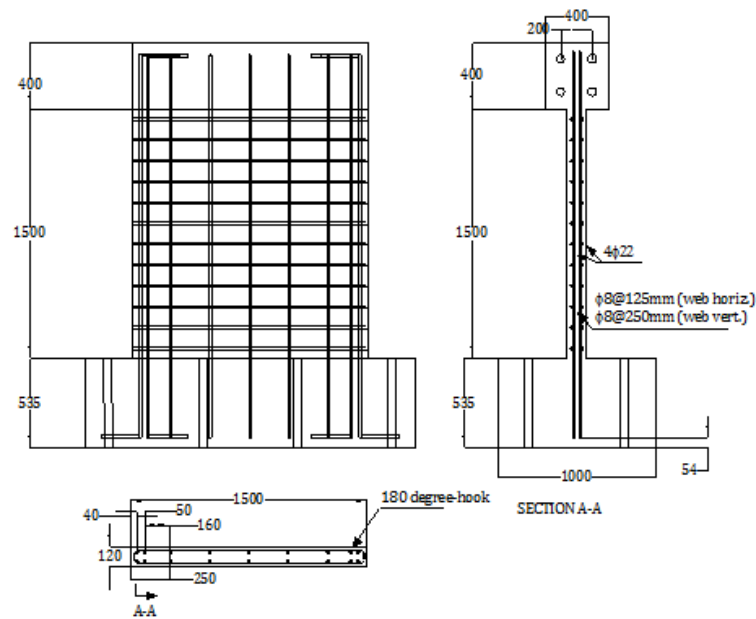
Geometry and Wall Reinforcement of Specimen T5-S1 (Terzioglu, 2011).
